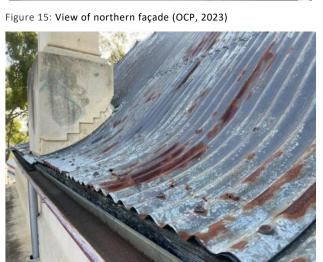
Existing corroded roof sheeting (OCP, 2023)
